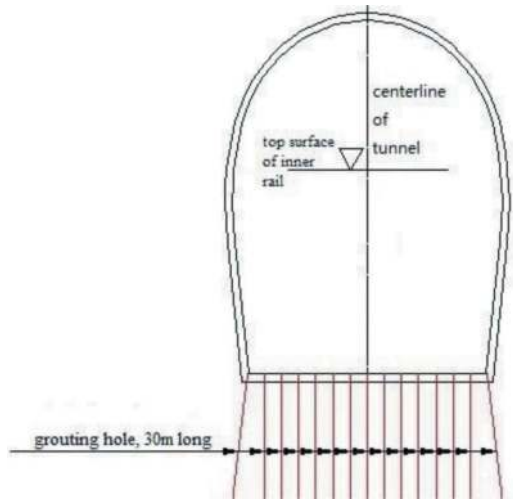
Diagram of tunnel bottom grouting reinforcement.
